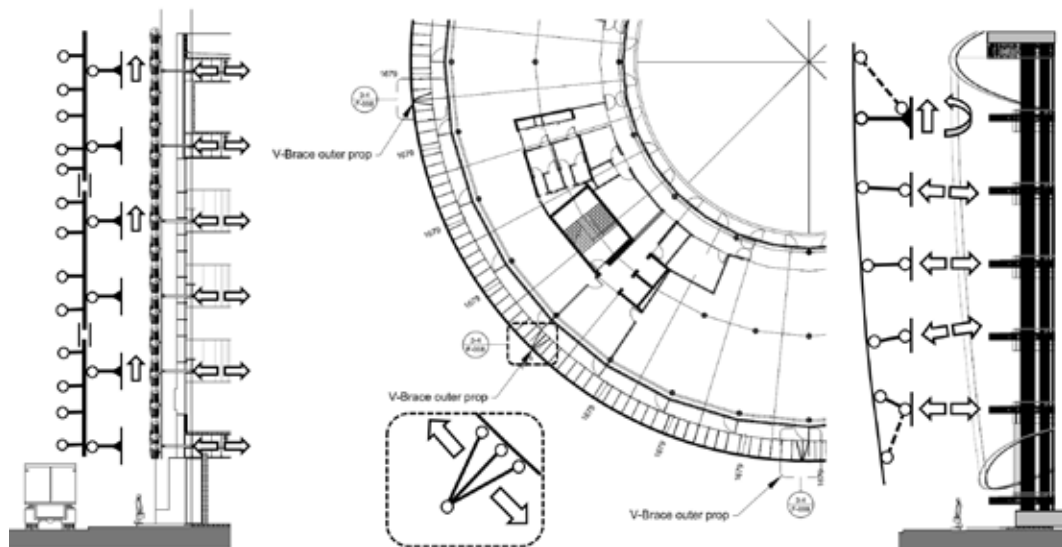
Schematic structural sections for dead load & wind, Mexico (left), Abidjan horiz. (center) and vert. section (right)
